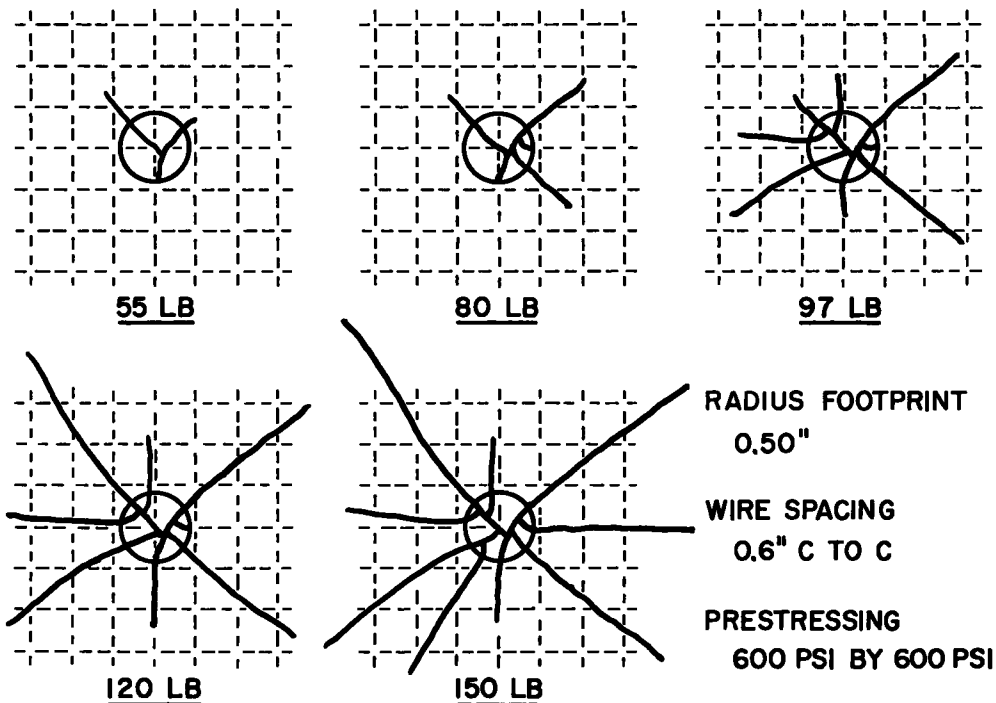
Progression of cracking for interior loading - Slab No. 1.
